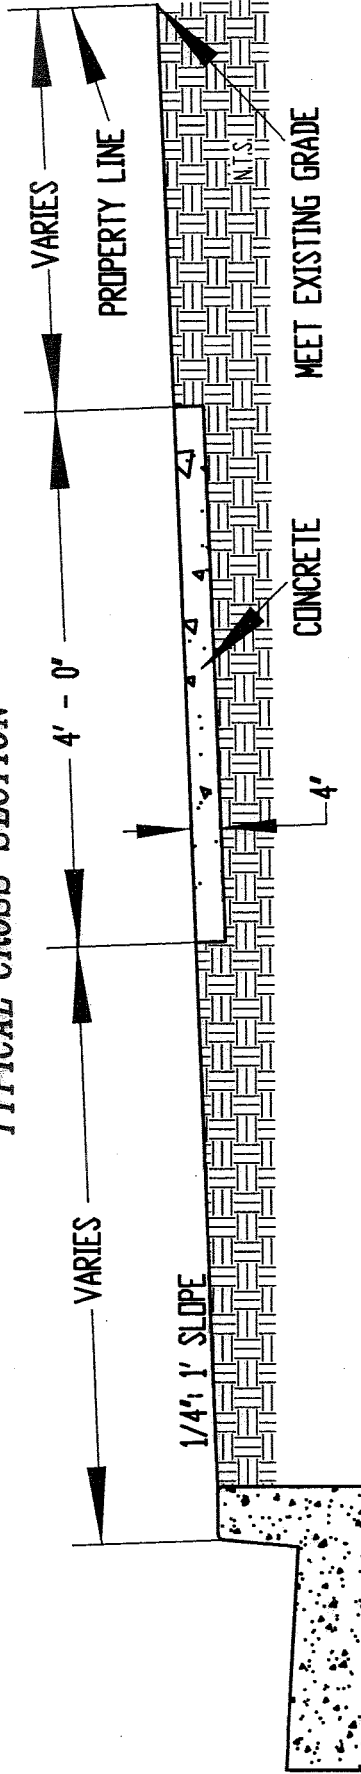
DETAIL OF CONCRETE SIDEWALK TYPICAL CROSS SECTION
